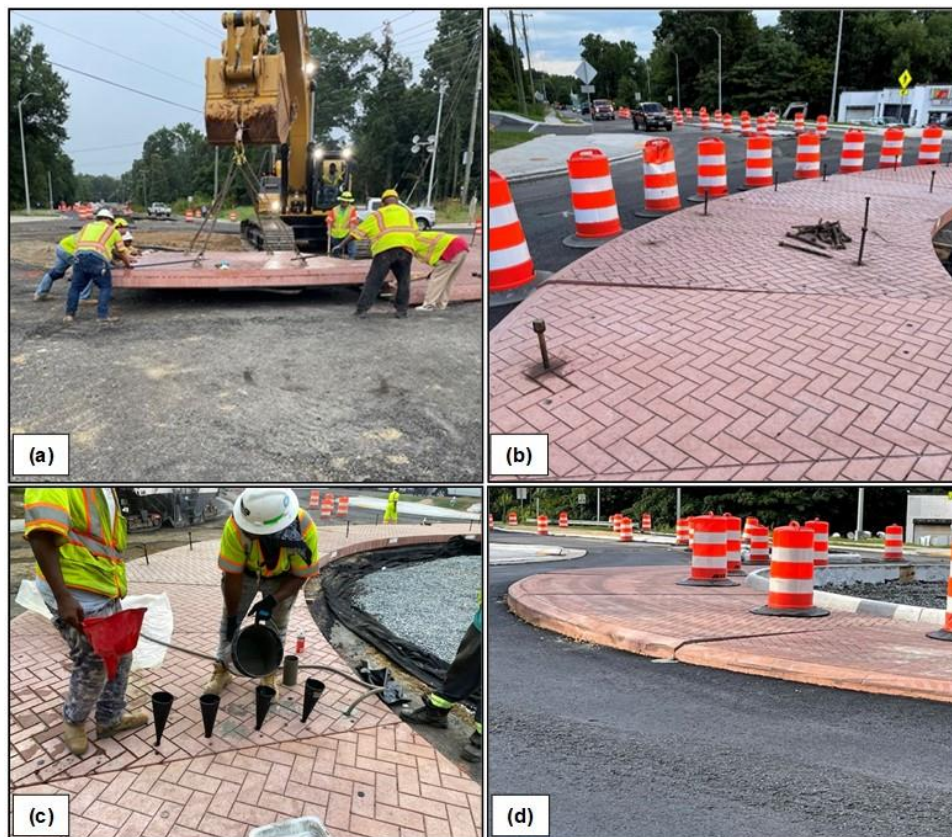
Construction Steps for Chesterfield, Virginia, Roundabout: (a) Excavator for Panel Installation; (b) Leveling Bolts to Correct Elevation; (c) Grouting Using Gravity Flow; (d) Final Surface after All Installation, Including Cast-in-Place Inner Curb
